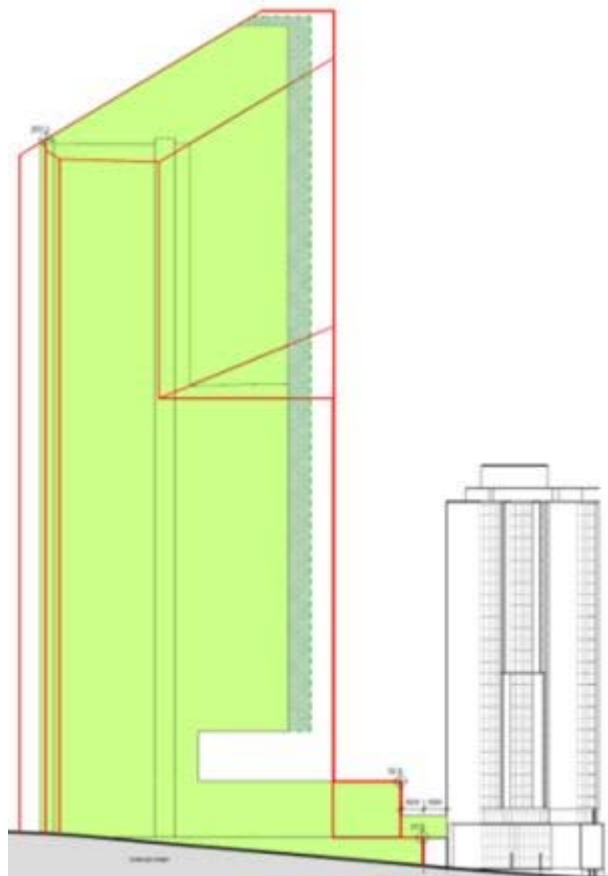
Stage 1 building massing – east elevation – shaded area = 10% additional design excellence bonus floor space
